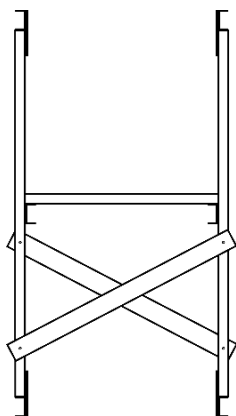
Cross-section of the bridge showing the stabilising structure connecting the two trusses.
